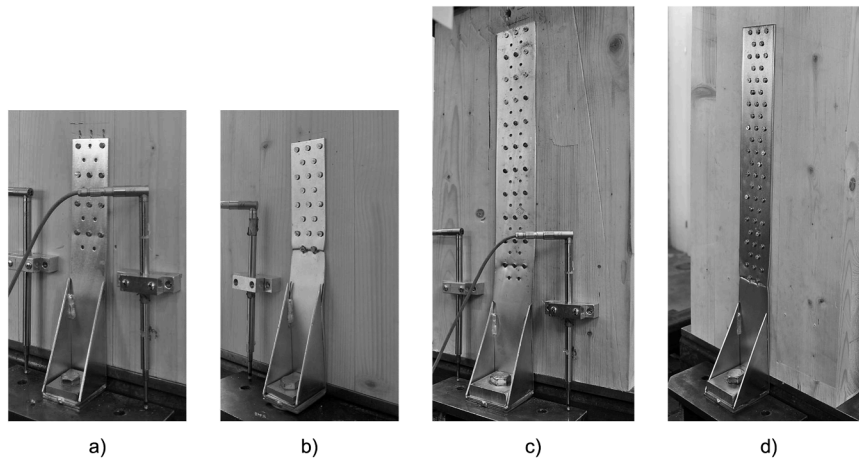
Traditional hold-downs under vertical-tensile load at the end of the test. Hold-down type-S: a) 12 nails (partial nailing-pattern) and; b) 20 nails (full-nailing pattern). Hold-down type-L: c) 33 nails (partial nailing-pattern) and; b) 55 nails (full-nailing pattern).
